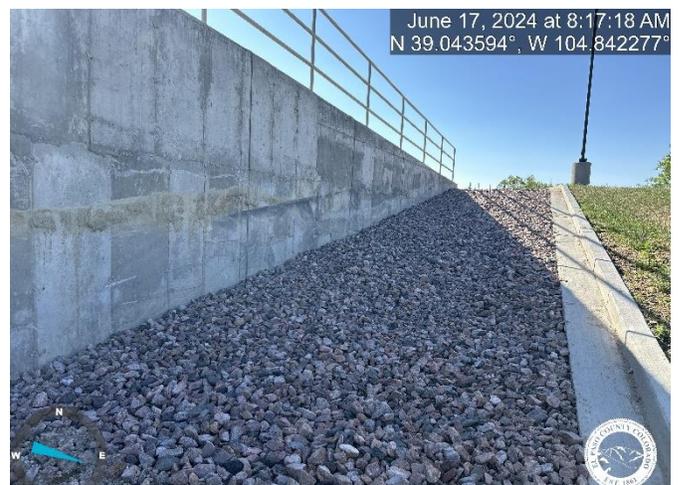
Plans call for Class 5 or 6 road base. 2-4" stone was installed. Show on as-builts.
